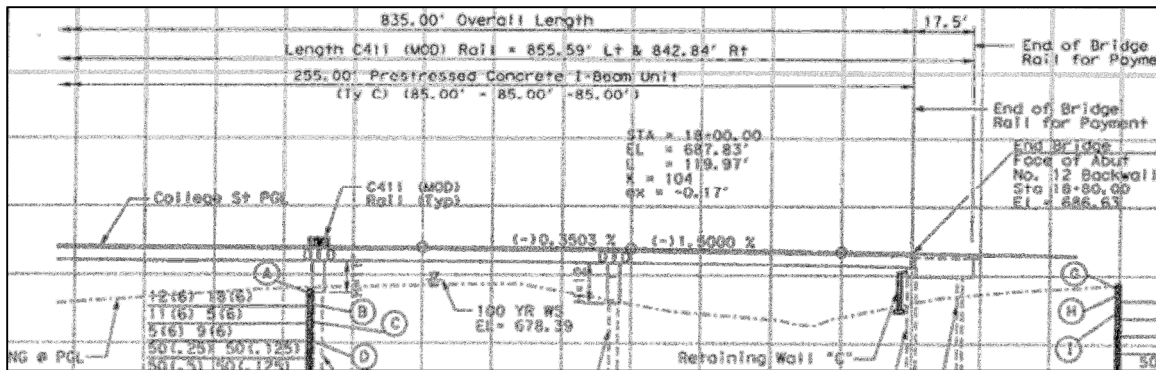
Elevation of Georgetown bridge deck winter pour.
